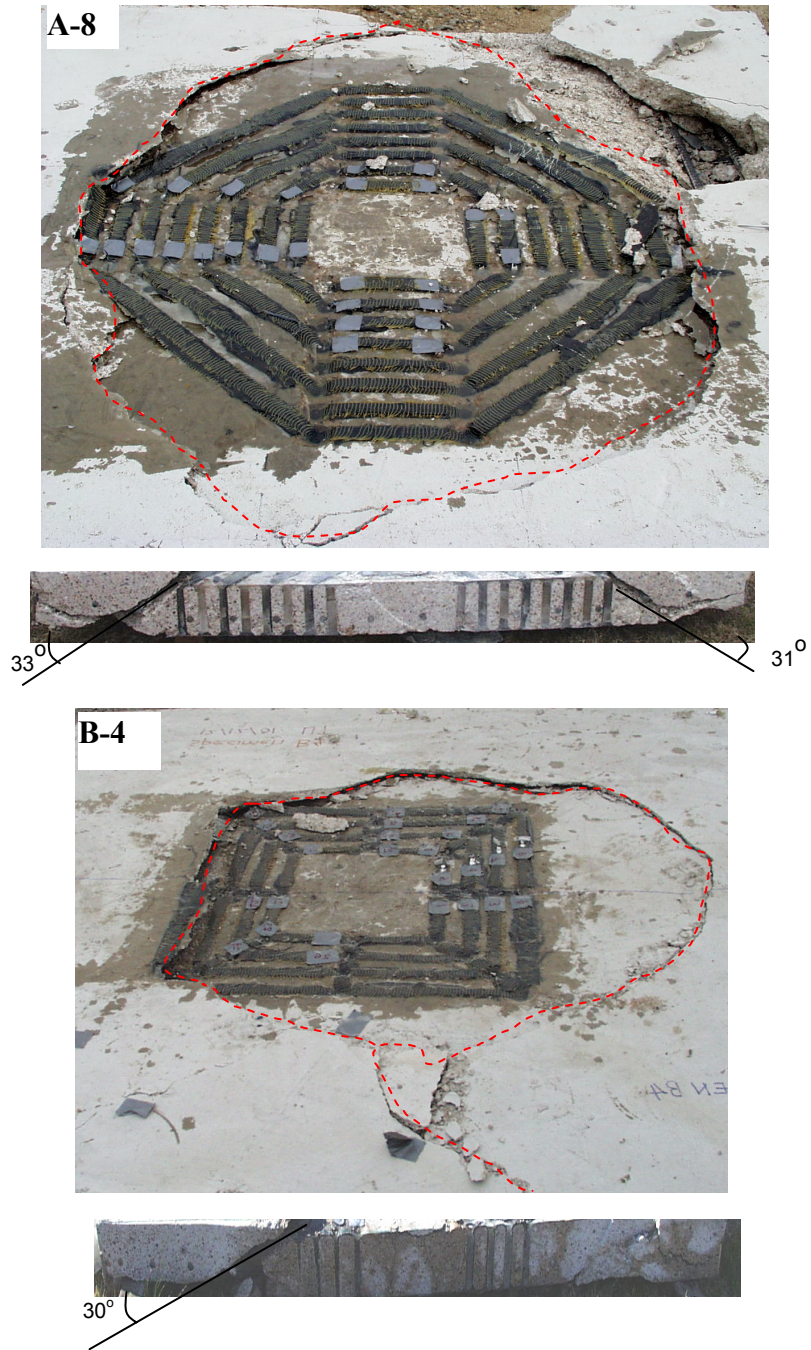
Failed Surfaces and Inclined Cracks for A-8 and B-4
